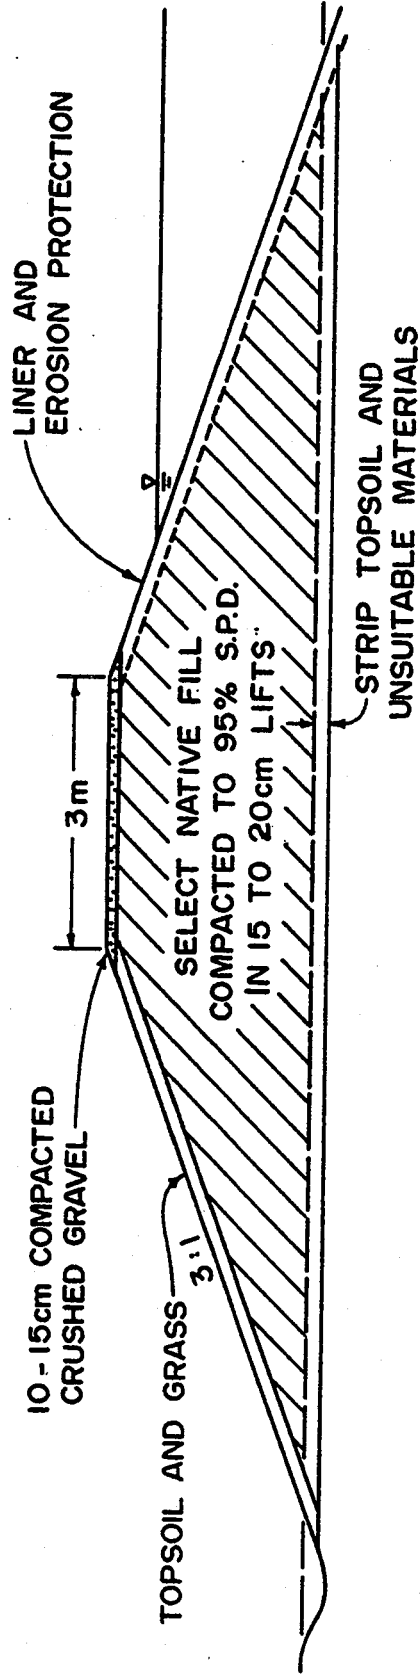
SCHEMATIC CROSS - SECTION OF TYPICAL SEWAGE LAGOON DYKE
